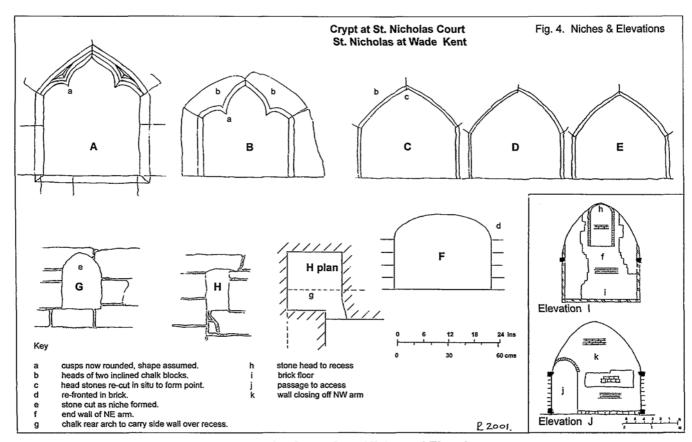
St Nicholas Court: Crypt Niches and Elevations
